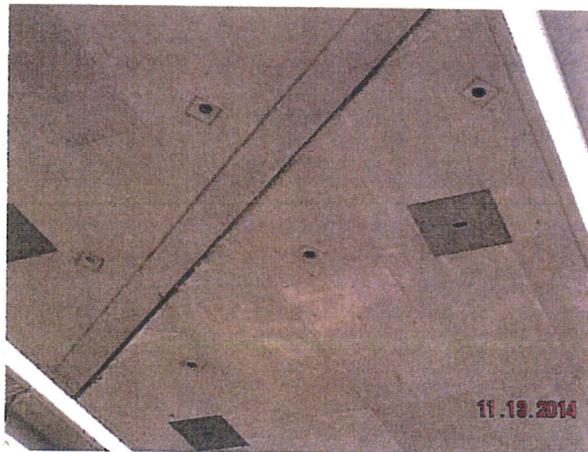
Bridge 50-0326L/R/CR-1 box girder system and expansion joint
